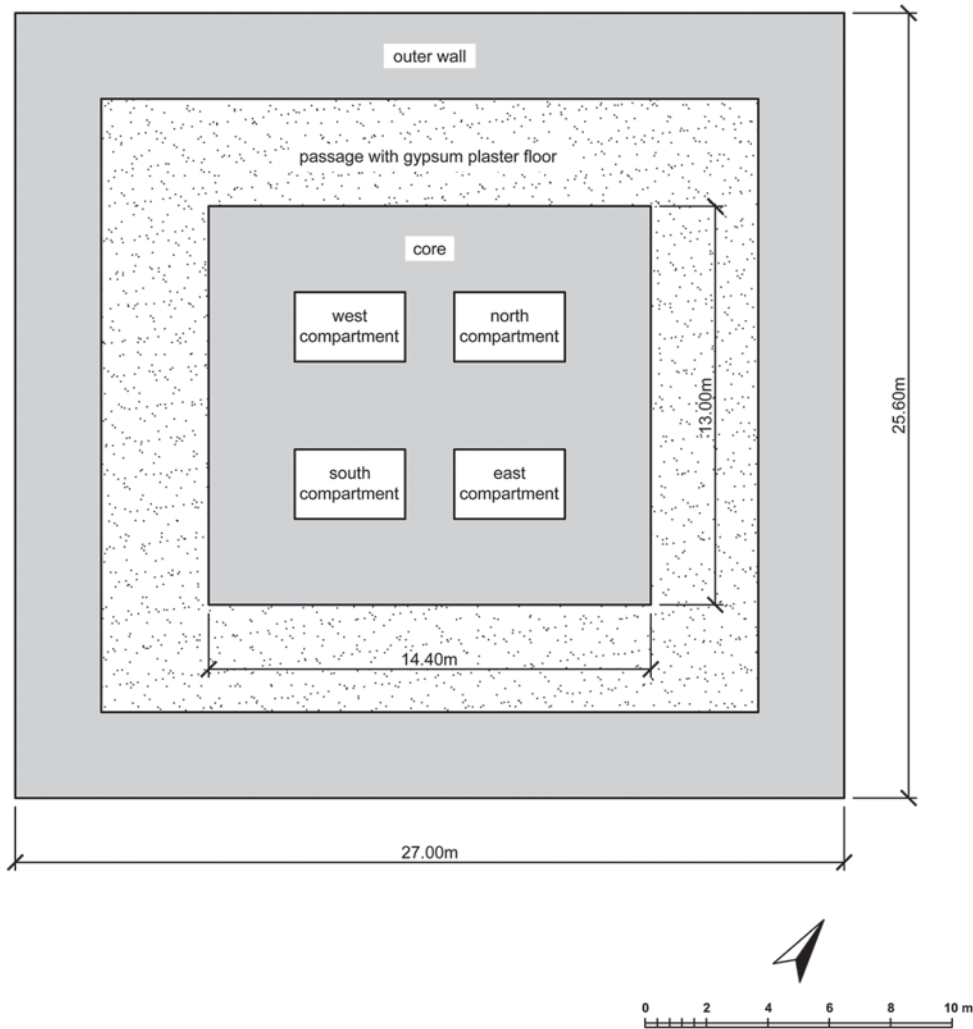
Reconstructed block plan of the Late Structure at a scale of 1:200, drawn by Ahmet Çinici.
